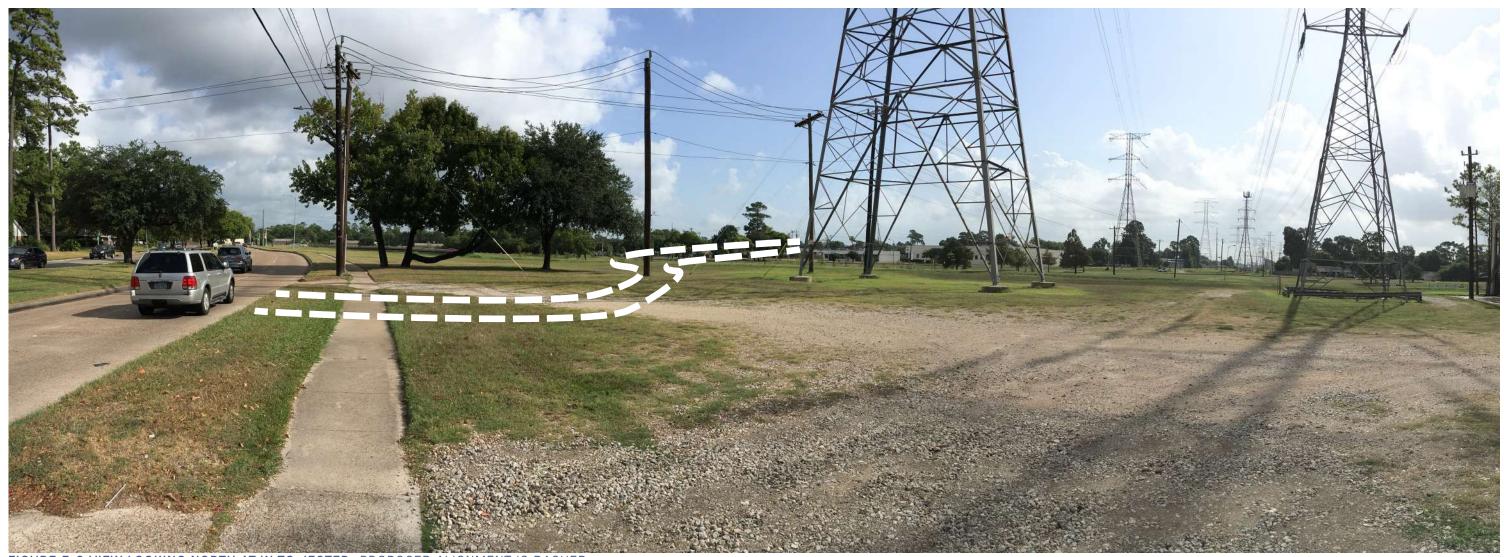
VIEW LOOKING NORTH AT W TC JESTER: PROPOSED ALIGNMENT IS DASHED
